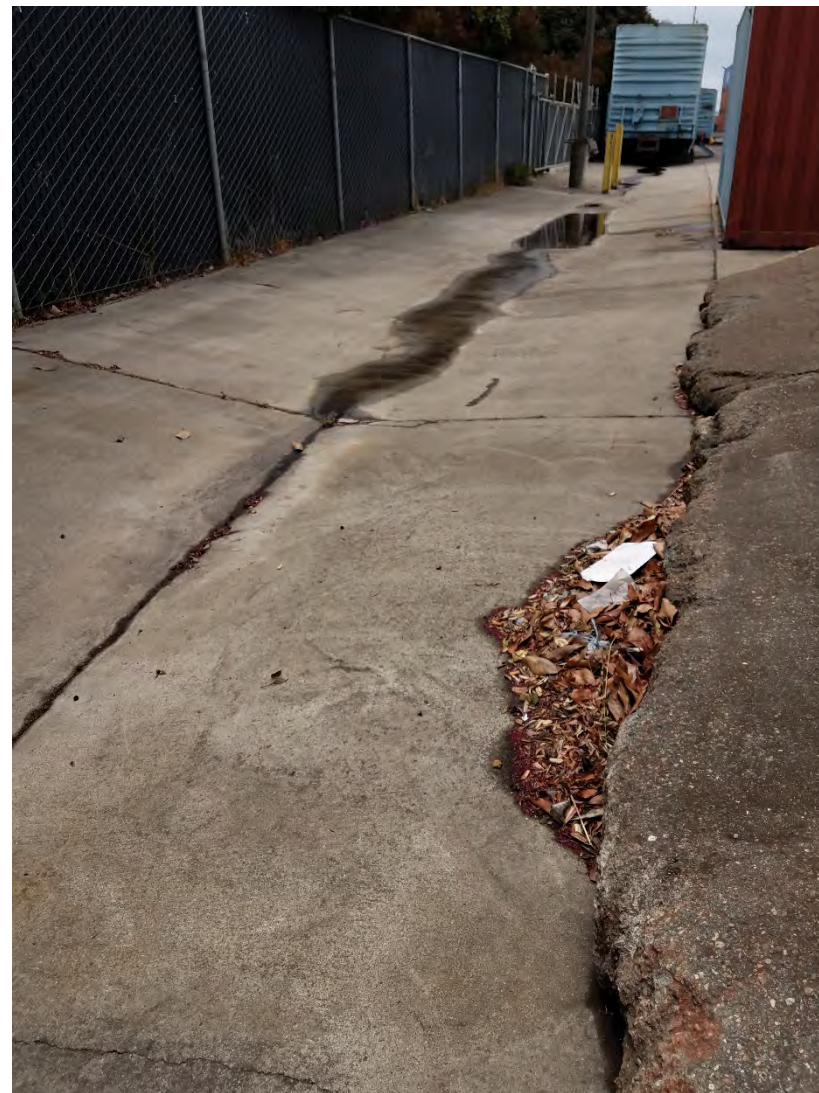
Looking south: seams gravel cover in railroad maintenance area.
